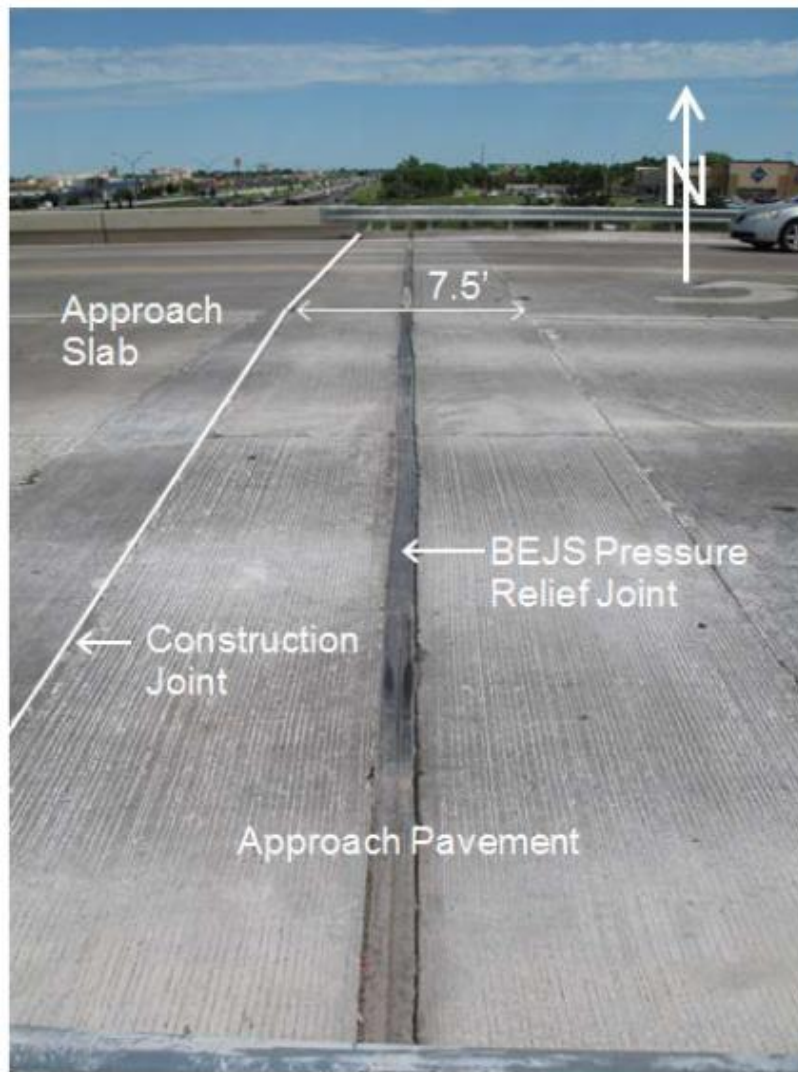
19th Street over I-35: Pressure relief joint installed in 2016
